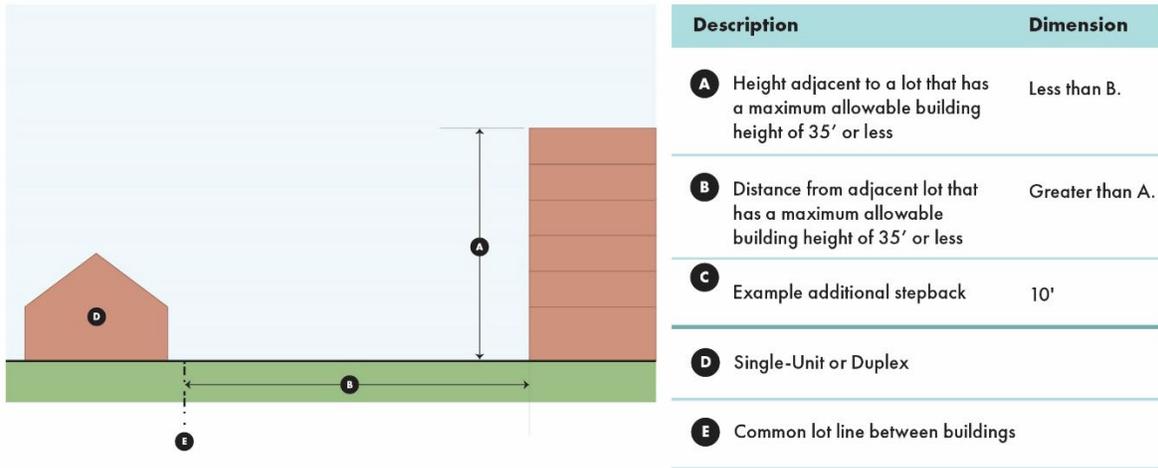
Example 65 ft tall building adjacent to a lot that has a lot that has a maximum building height of 35' or less with additional step-backs and vertical breaks if the distance between the two buildings is less than the total height of the building
